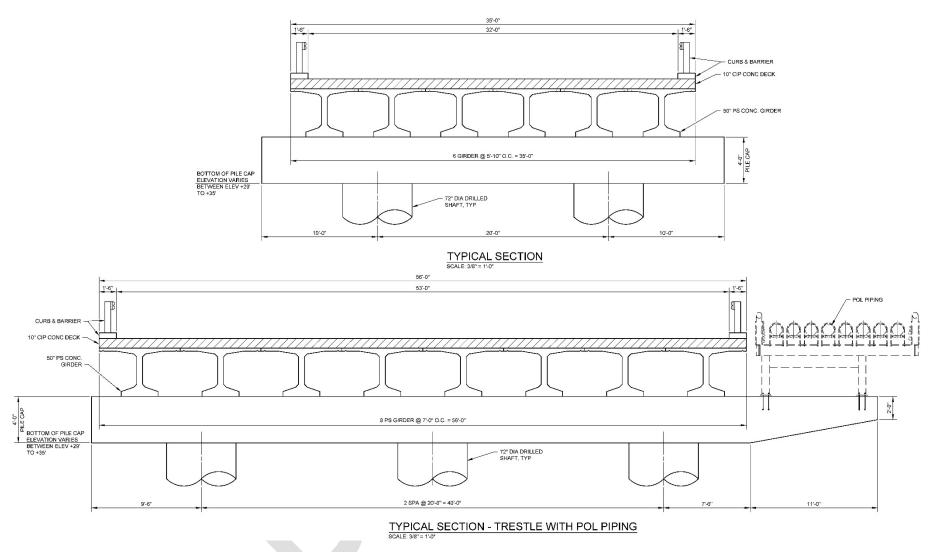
Typical Section for Typical and POL Access Trestles: Alternative 2B with 72-inch-diameter Drilled Shafts
